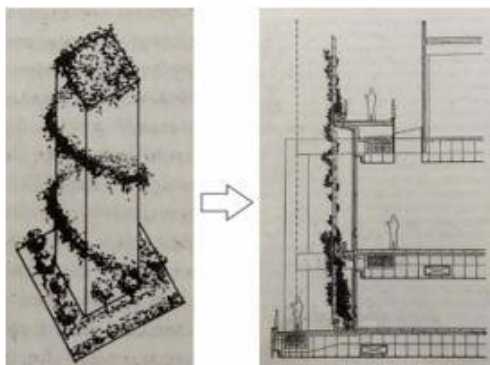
Vertical landscape on sky-court and its application to building design [7].
